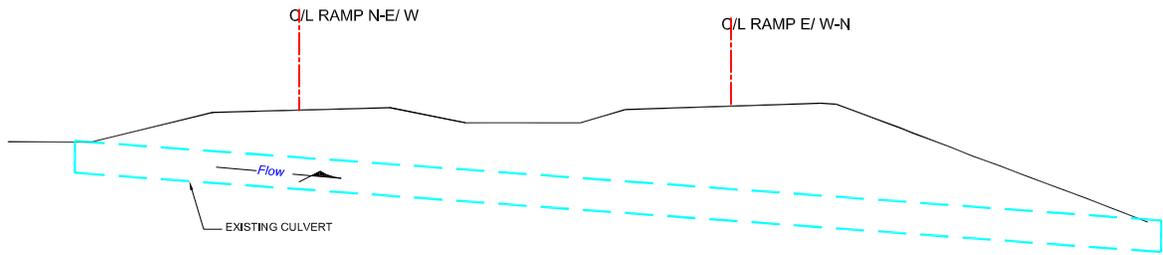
TEMPORARY LOCAL DETOUR AND OPEN CUT UNSUPPORTED EXCAVATION (OPTION 3)
